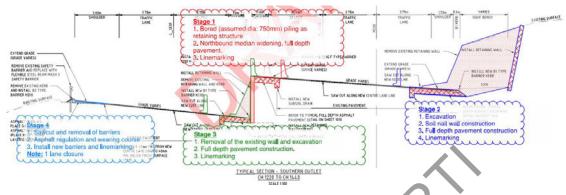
Typical section - Southern Outlet Ch. 1220 to Ch. 1440
